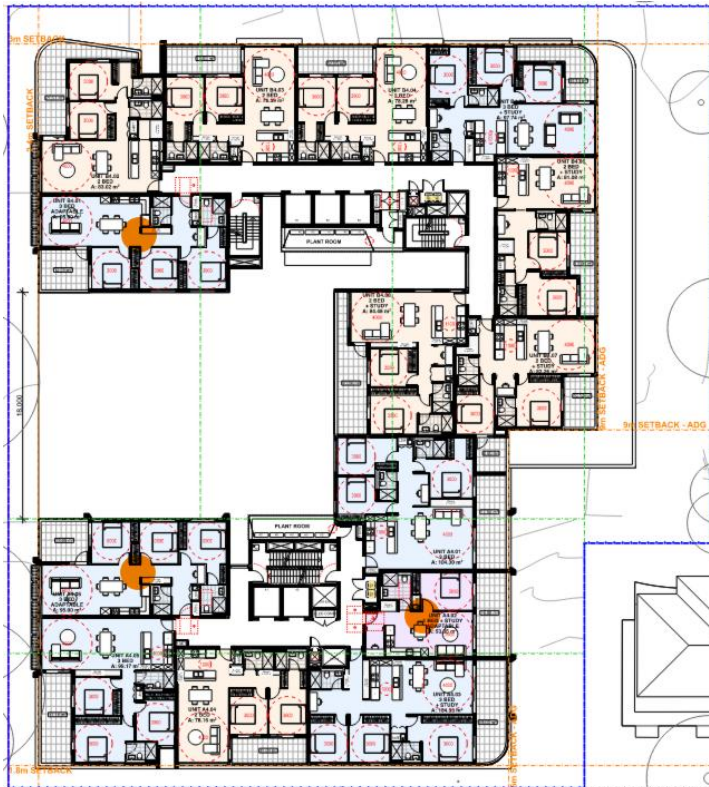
Fourth Floor Adaptable Unit Location on Architectural Plans
